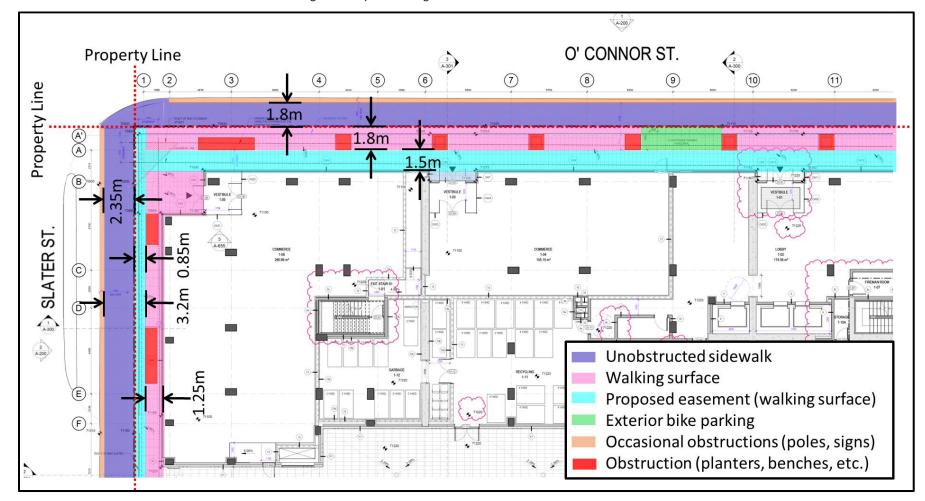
Proposed Walking Facilities on O'Connor St and Slater St
